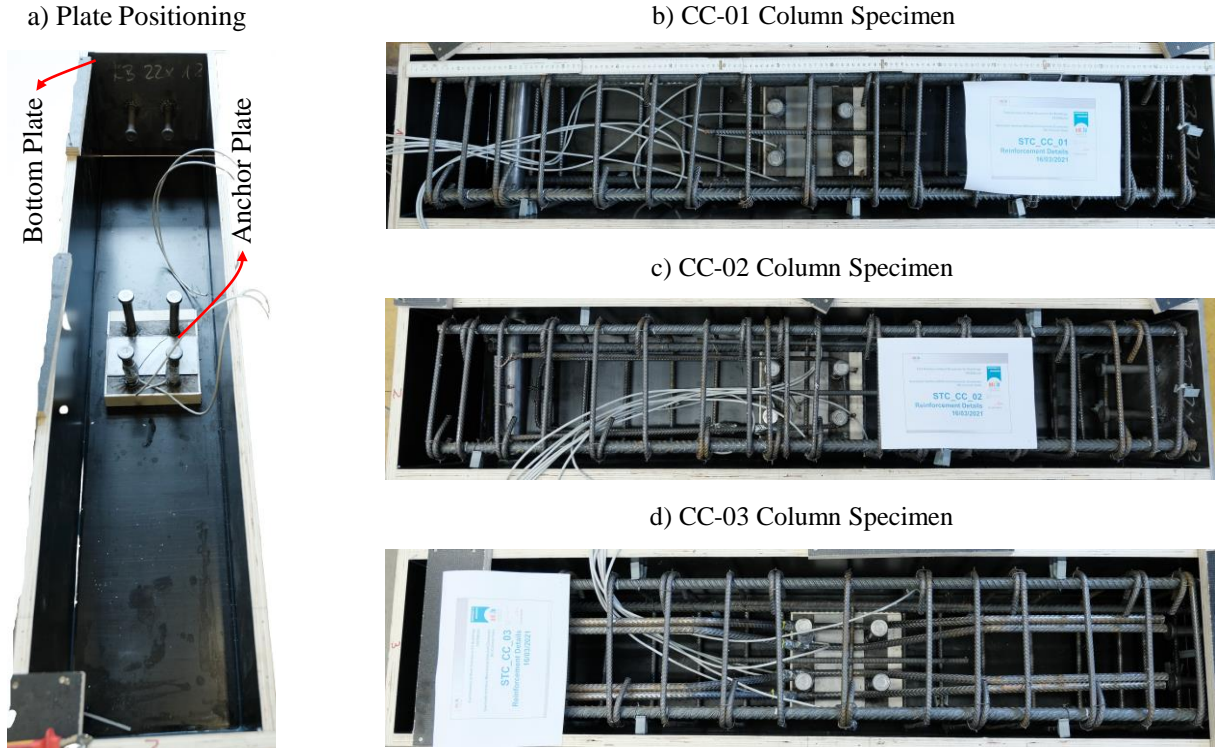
Form-works, positioning of the anchor and bottom plates and steel reinforcements.
